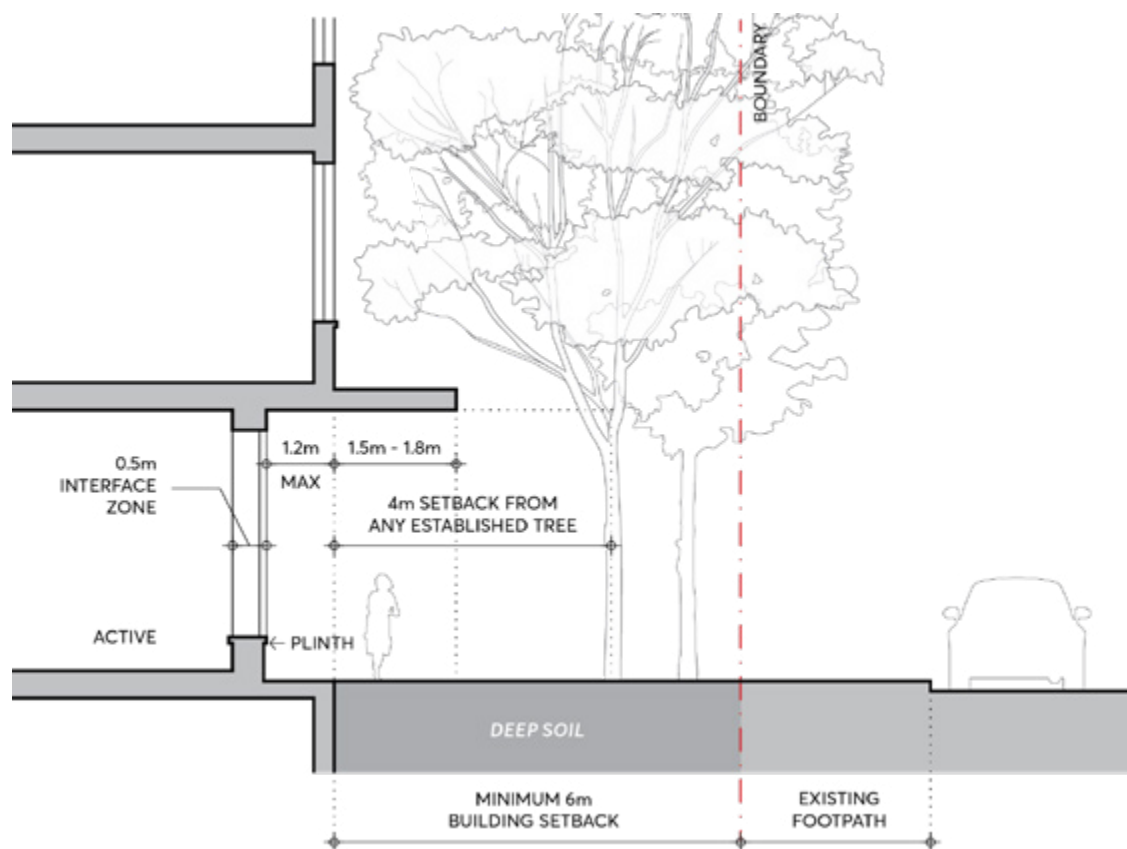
Great Western Highway Ground Floor Interface
